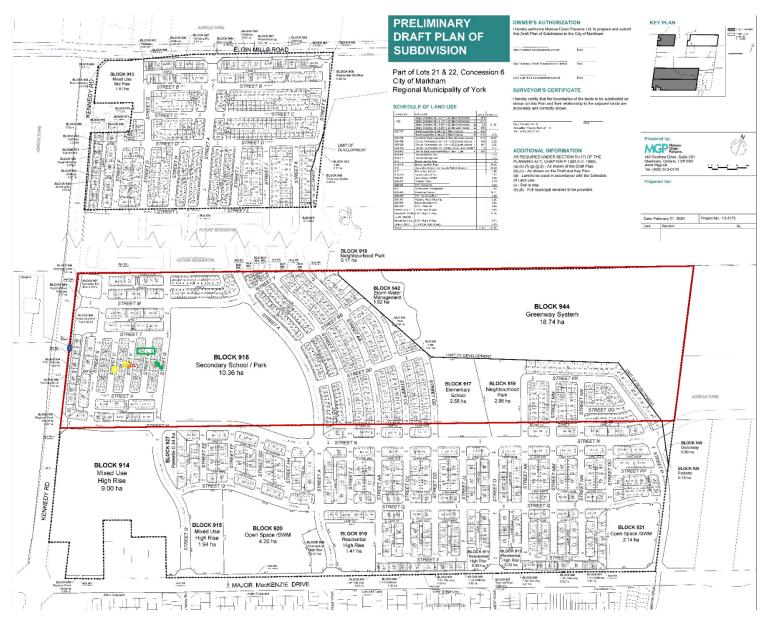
Preliminary draft plan of subdivision with structures from Figure 13 overlaid.
